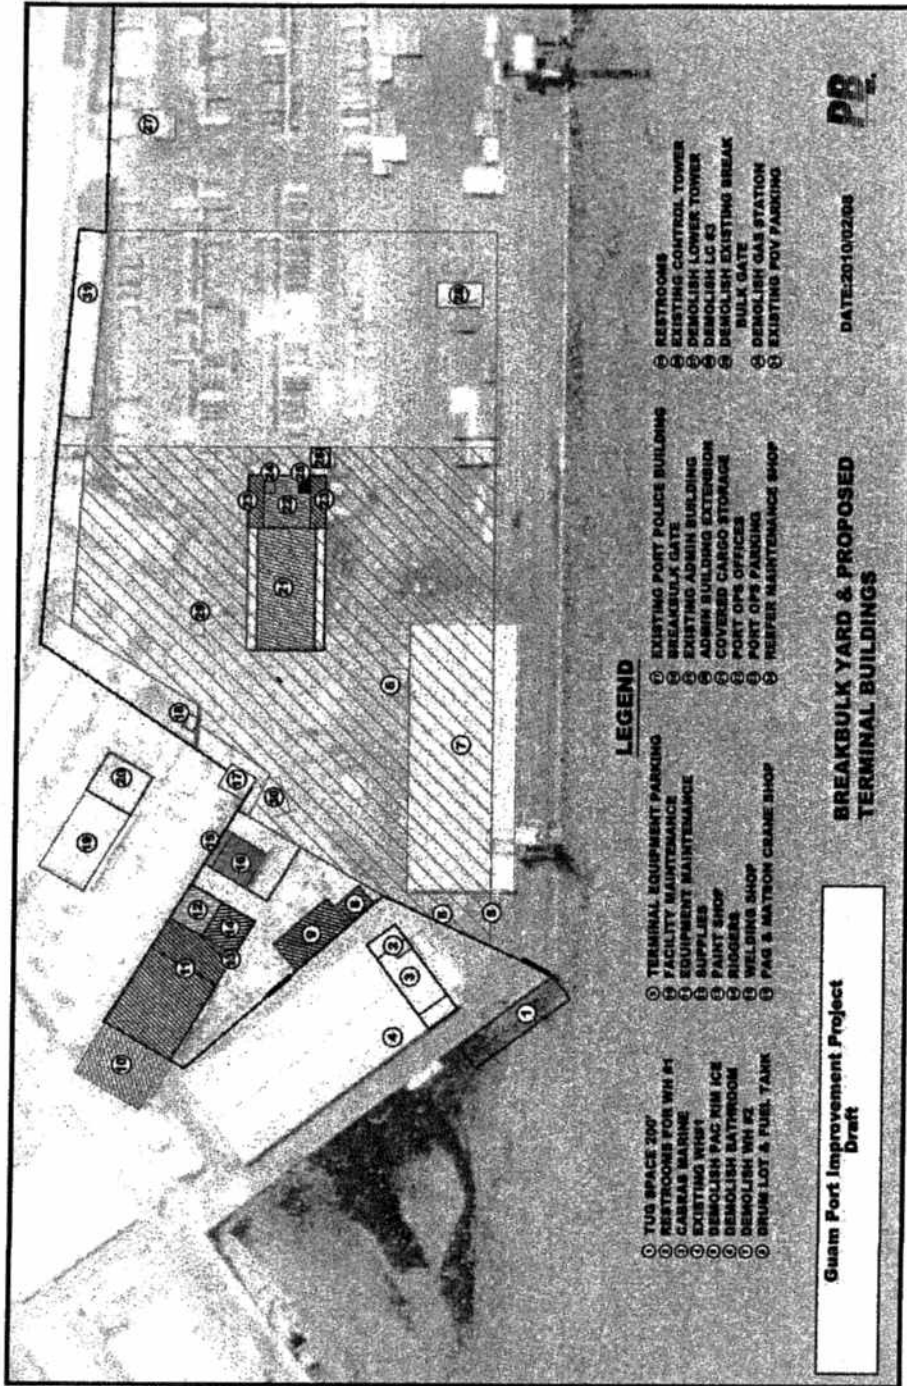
Breakbulk Yard and Proposed Terminal Buildings
